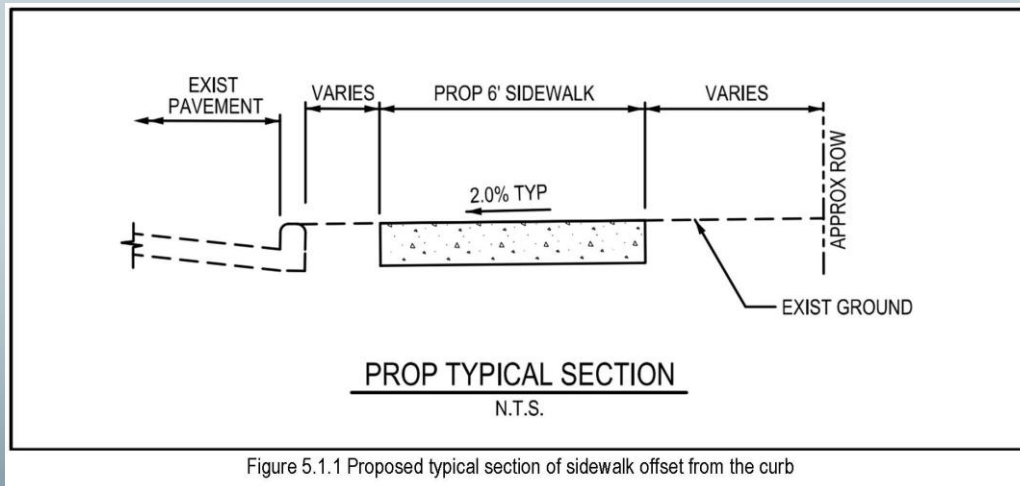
Proposed typical section of sidewalk offset from the curb
